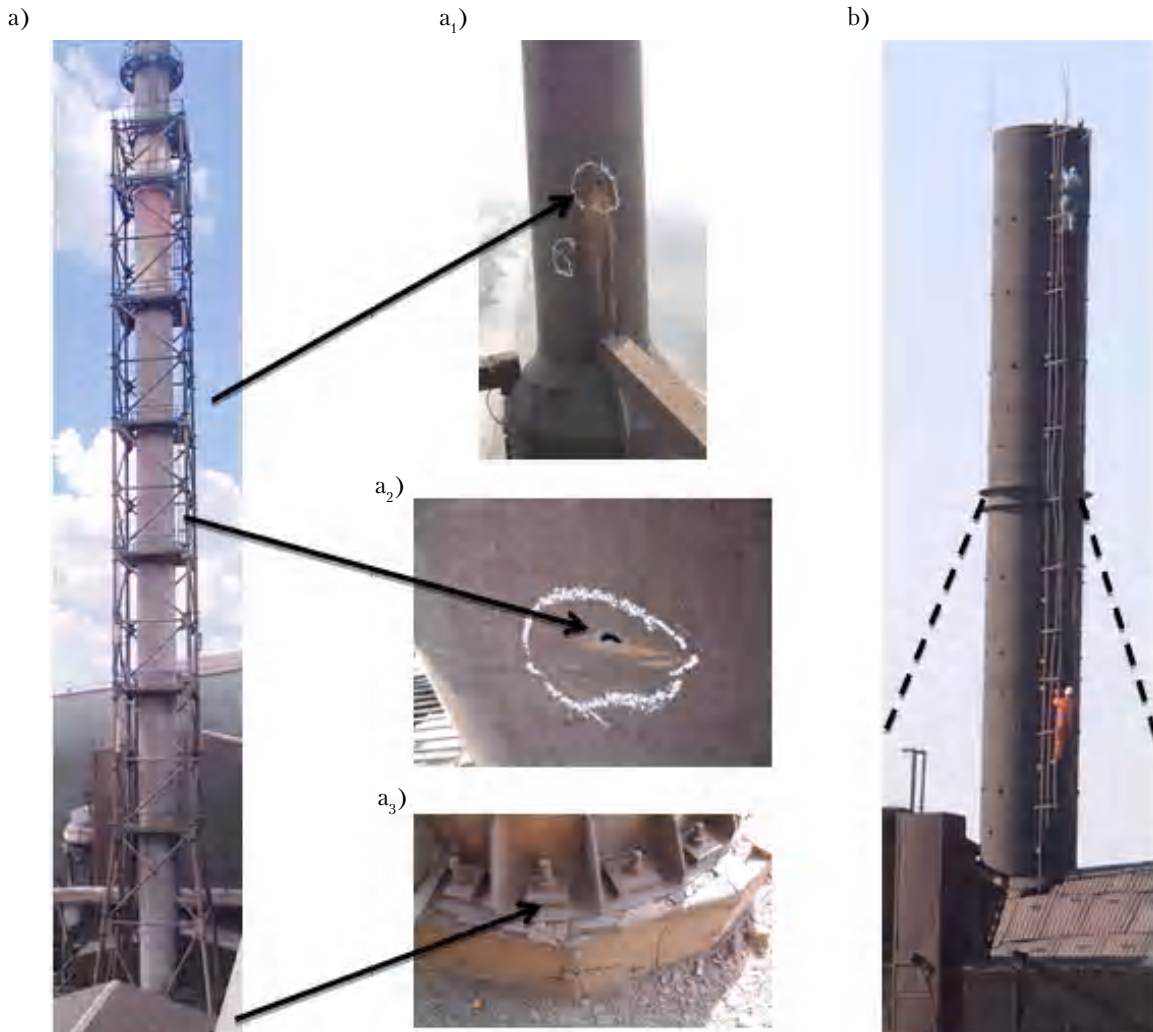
Defects and damages: a) gas exhaust trunks: a₁) burnout in support frame; a₂) burnout in a shell of gas exhaust trunk; a₃) destruction of the supporting basement; b) metal chimneys – backstays, provided by the project, are absent.
